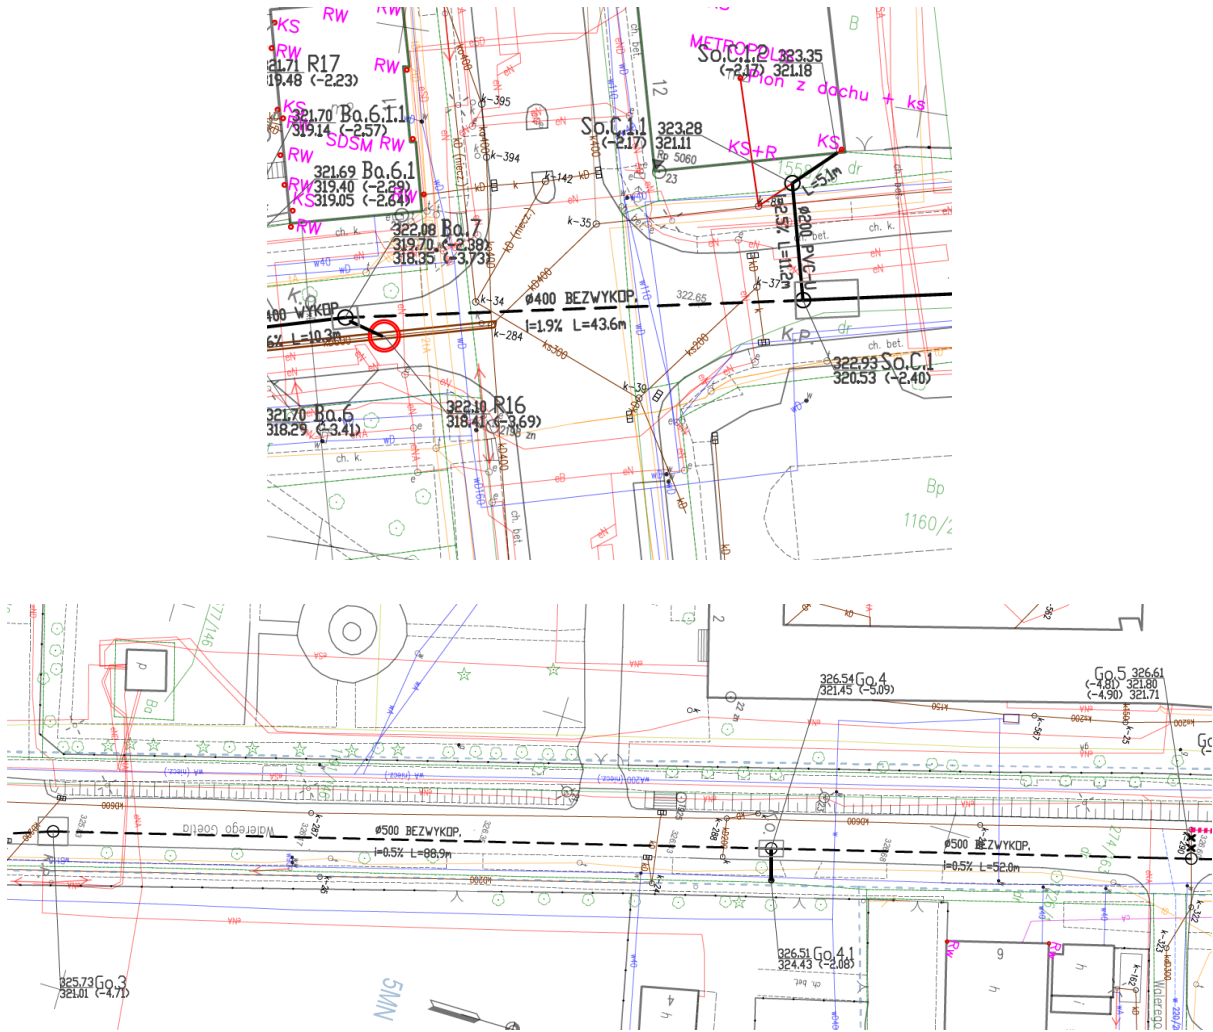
Trenchless technologies DN400mm and DN500mm planimetry
